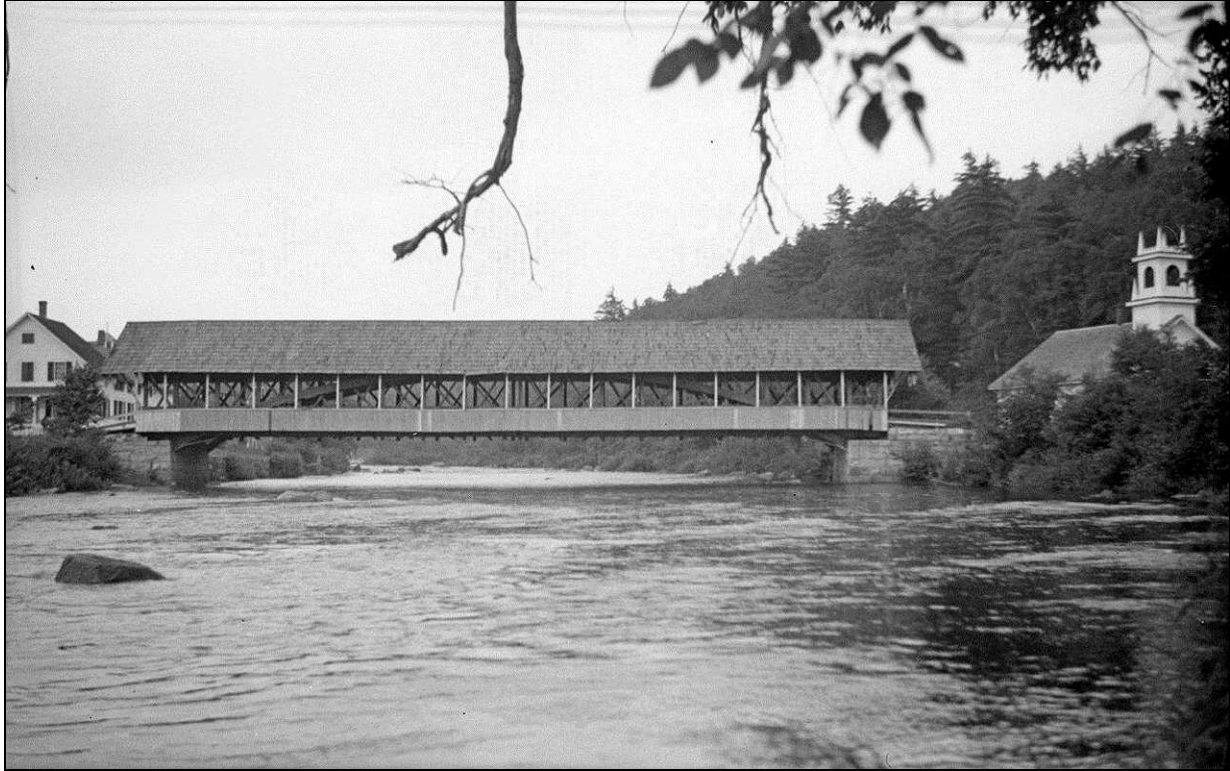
Early 20th century view (undated) of west elevation of Stark bridge. Note replacement of missing siding boards seen in Figure 4 above. (Source: Collection of the National Society for the Preservation of Covered Bridges).
